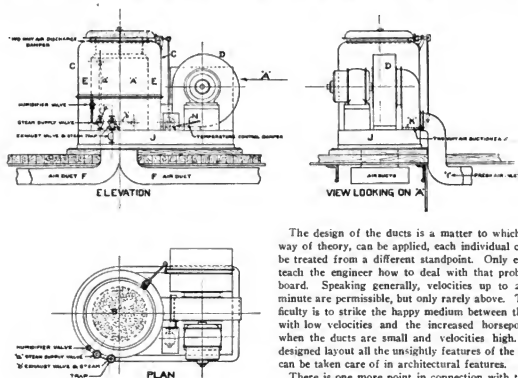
OPEN-DECK TYPE THERMOPAN.
